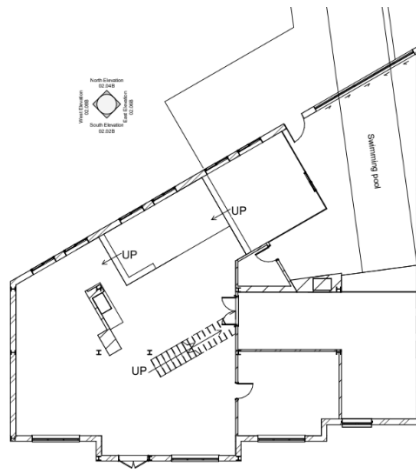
Ground Floor as Approved (19/01641/FUL and 18/01983/HOUSE):
